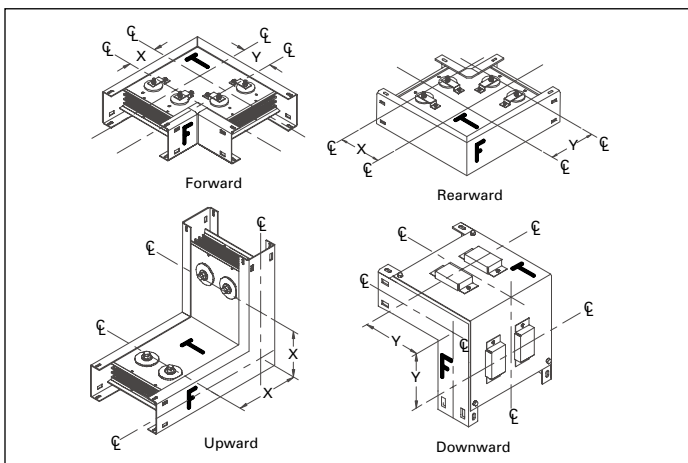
Corner Joint Elbows (For Indoor Applications Only)
